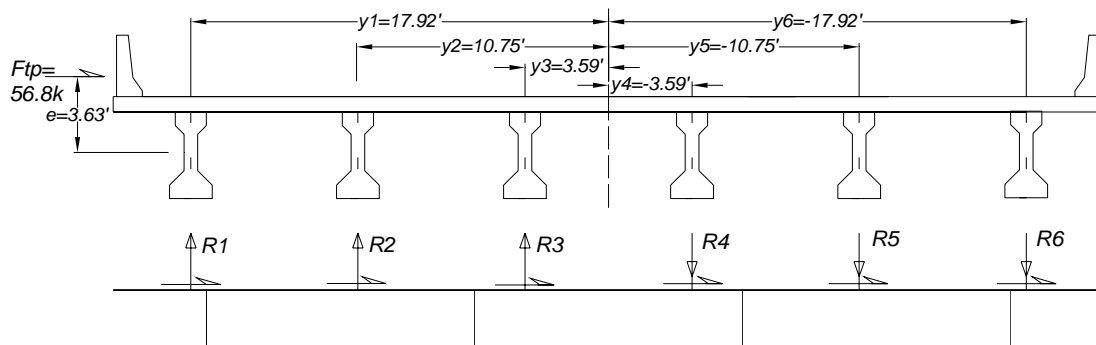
Girder reactions on pile cap due to wind load on super structure
